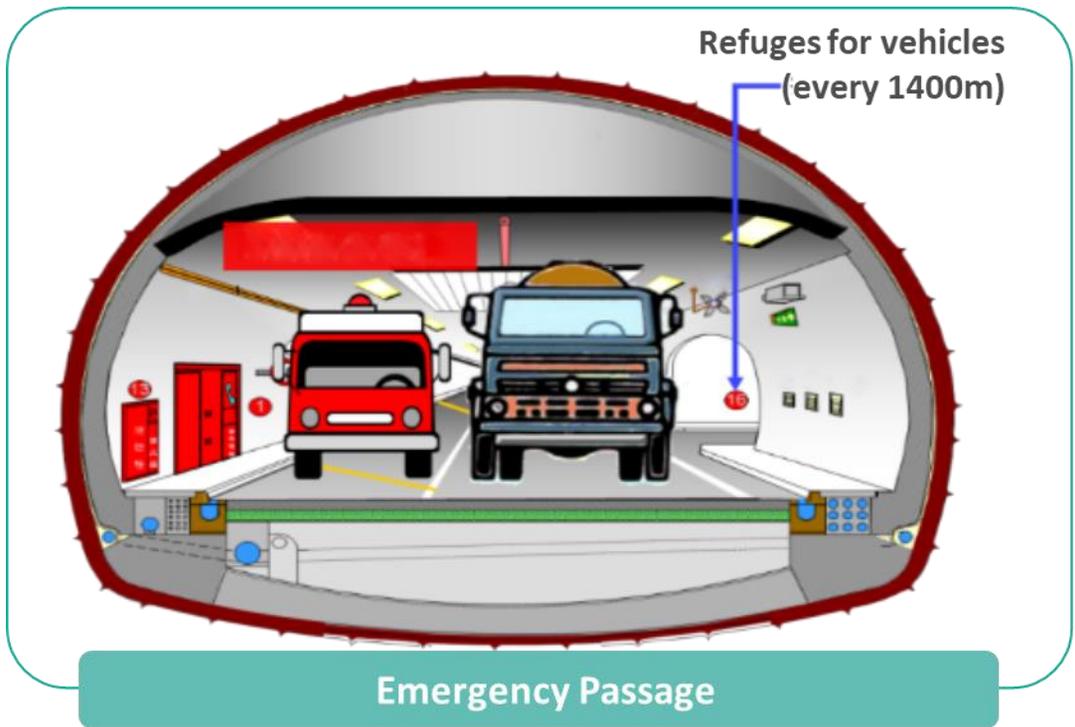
Schematic Layout of Vehicular Cross-passage in Tunnel
